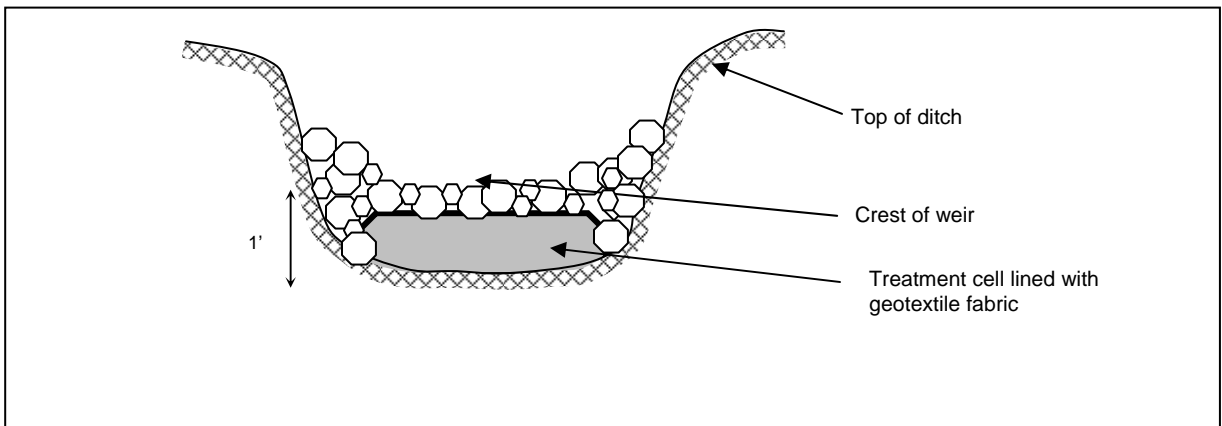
Cross-section of ditch with In-line Ditch Modified Rock Check Dam BMP
